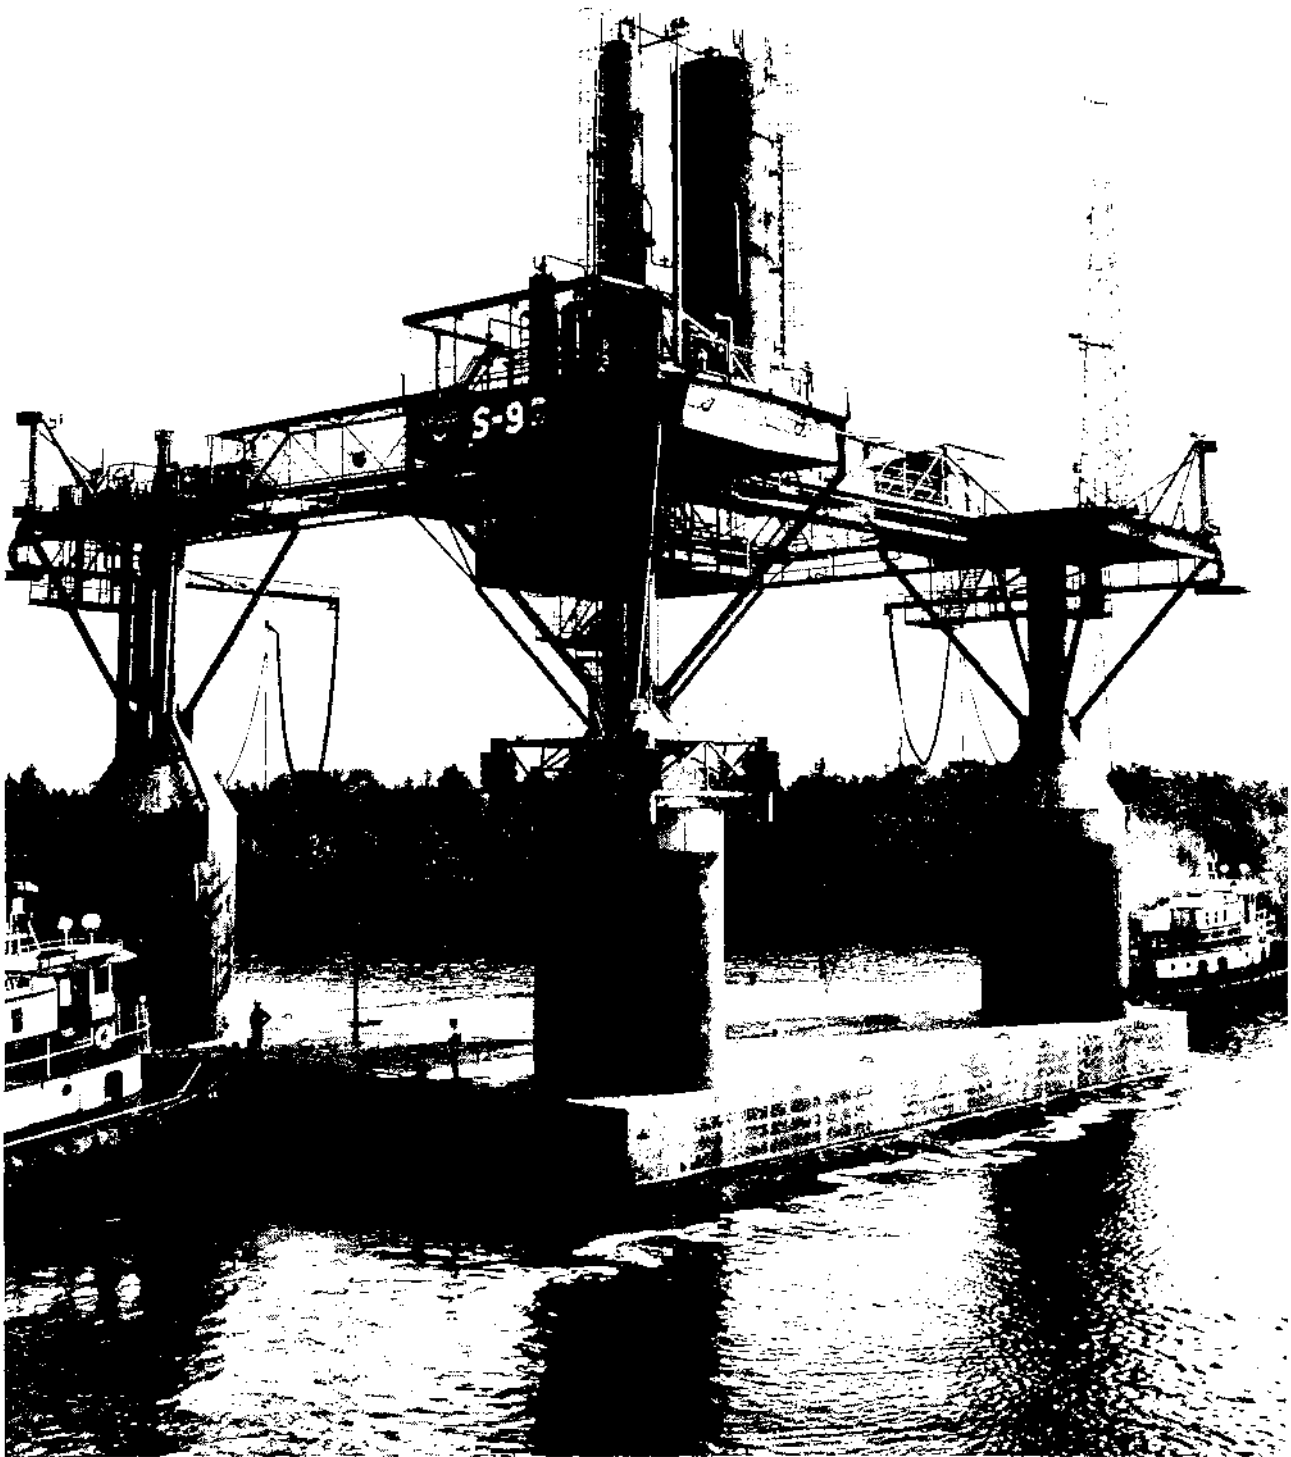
Submerged Storage—Bottom Supported (Above- and Below-Water Structure).
